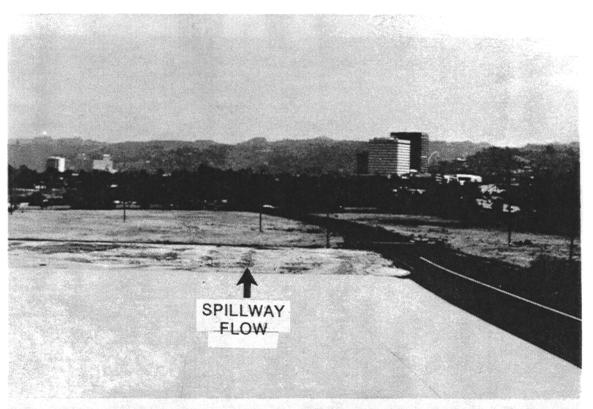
Spillway Apron, with Outlet Channel to right (view from spillway bridge, toward downstream).
